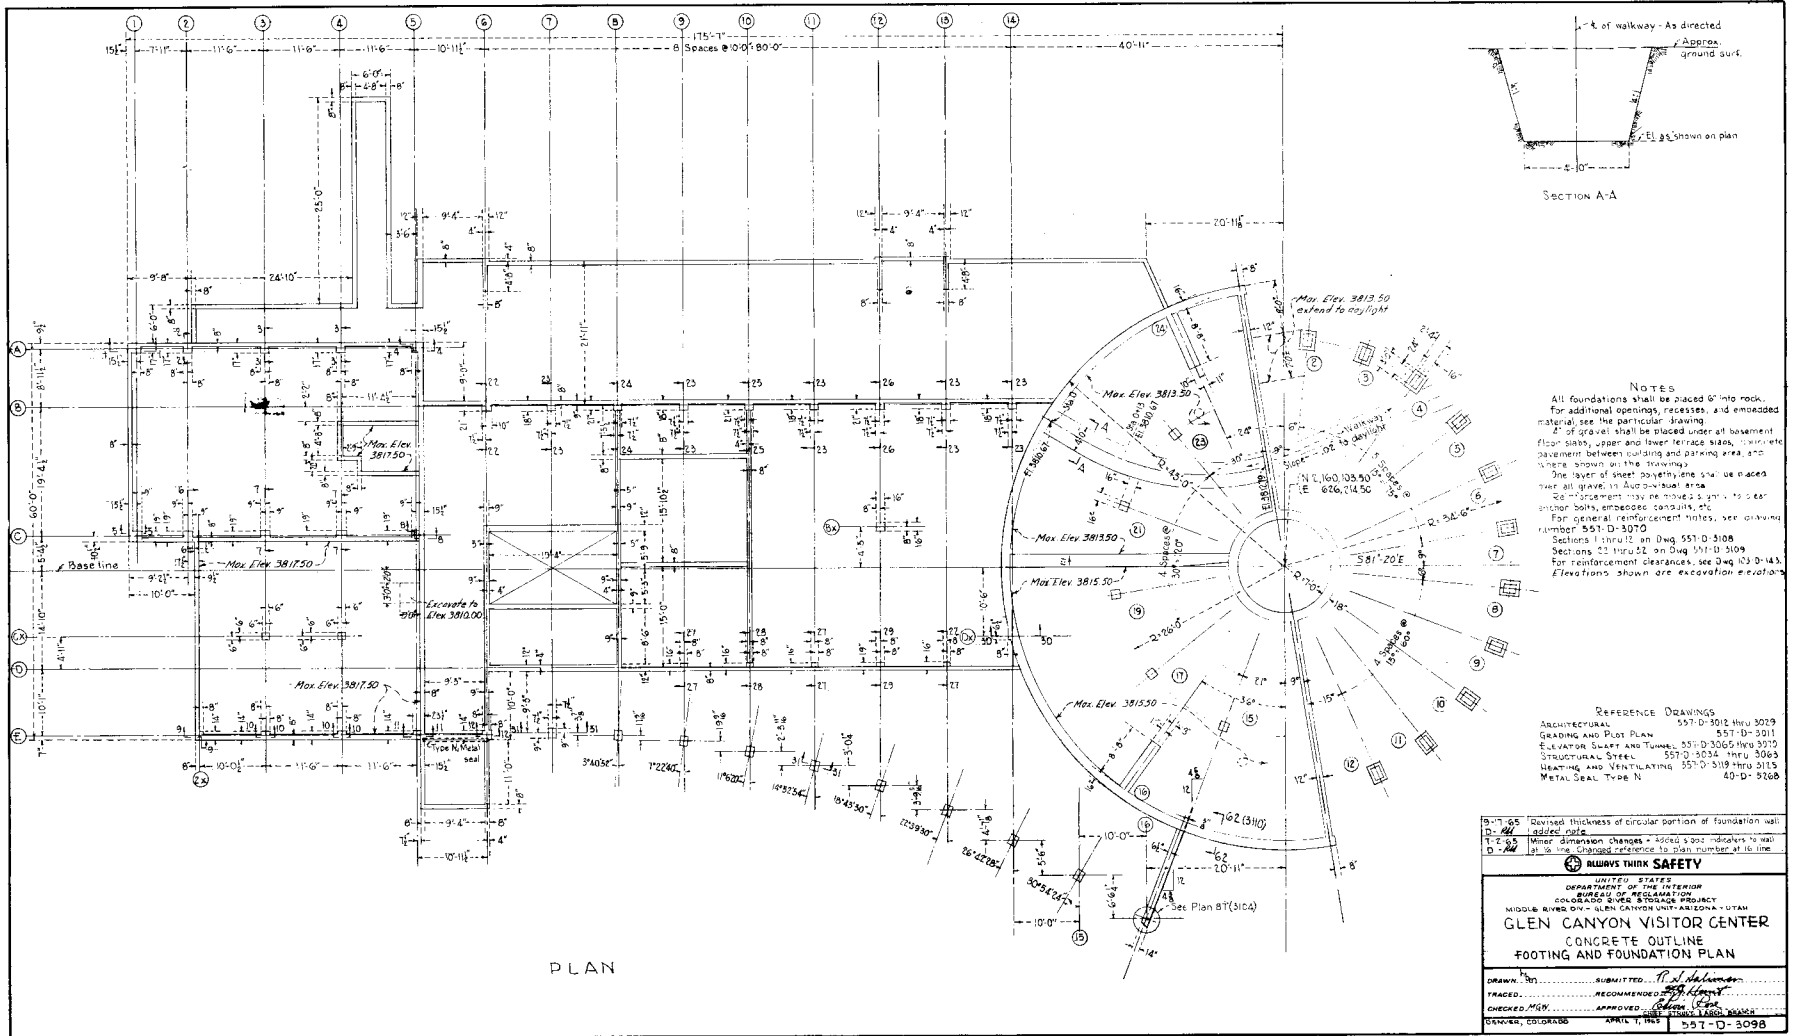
Visitor center—Concrete outline, footing and foundation plan.
